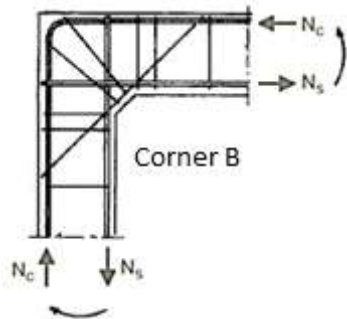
Opening moment (Walraven, *Staafterkmodellen als basis voor het detailleren van betonconstructies*, 1988).
